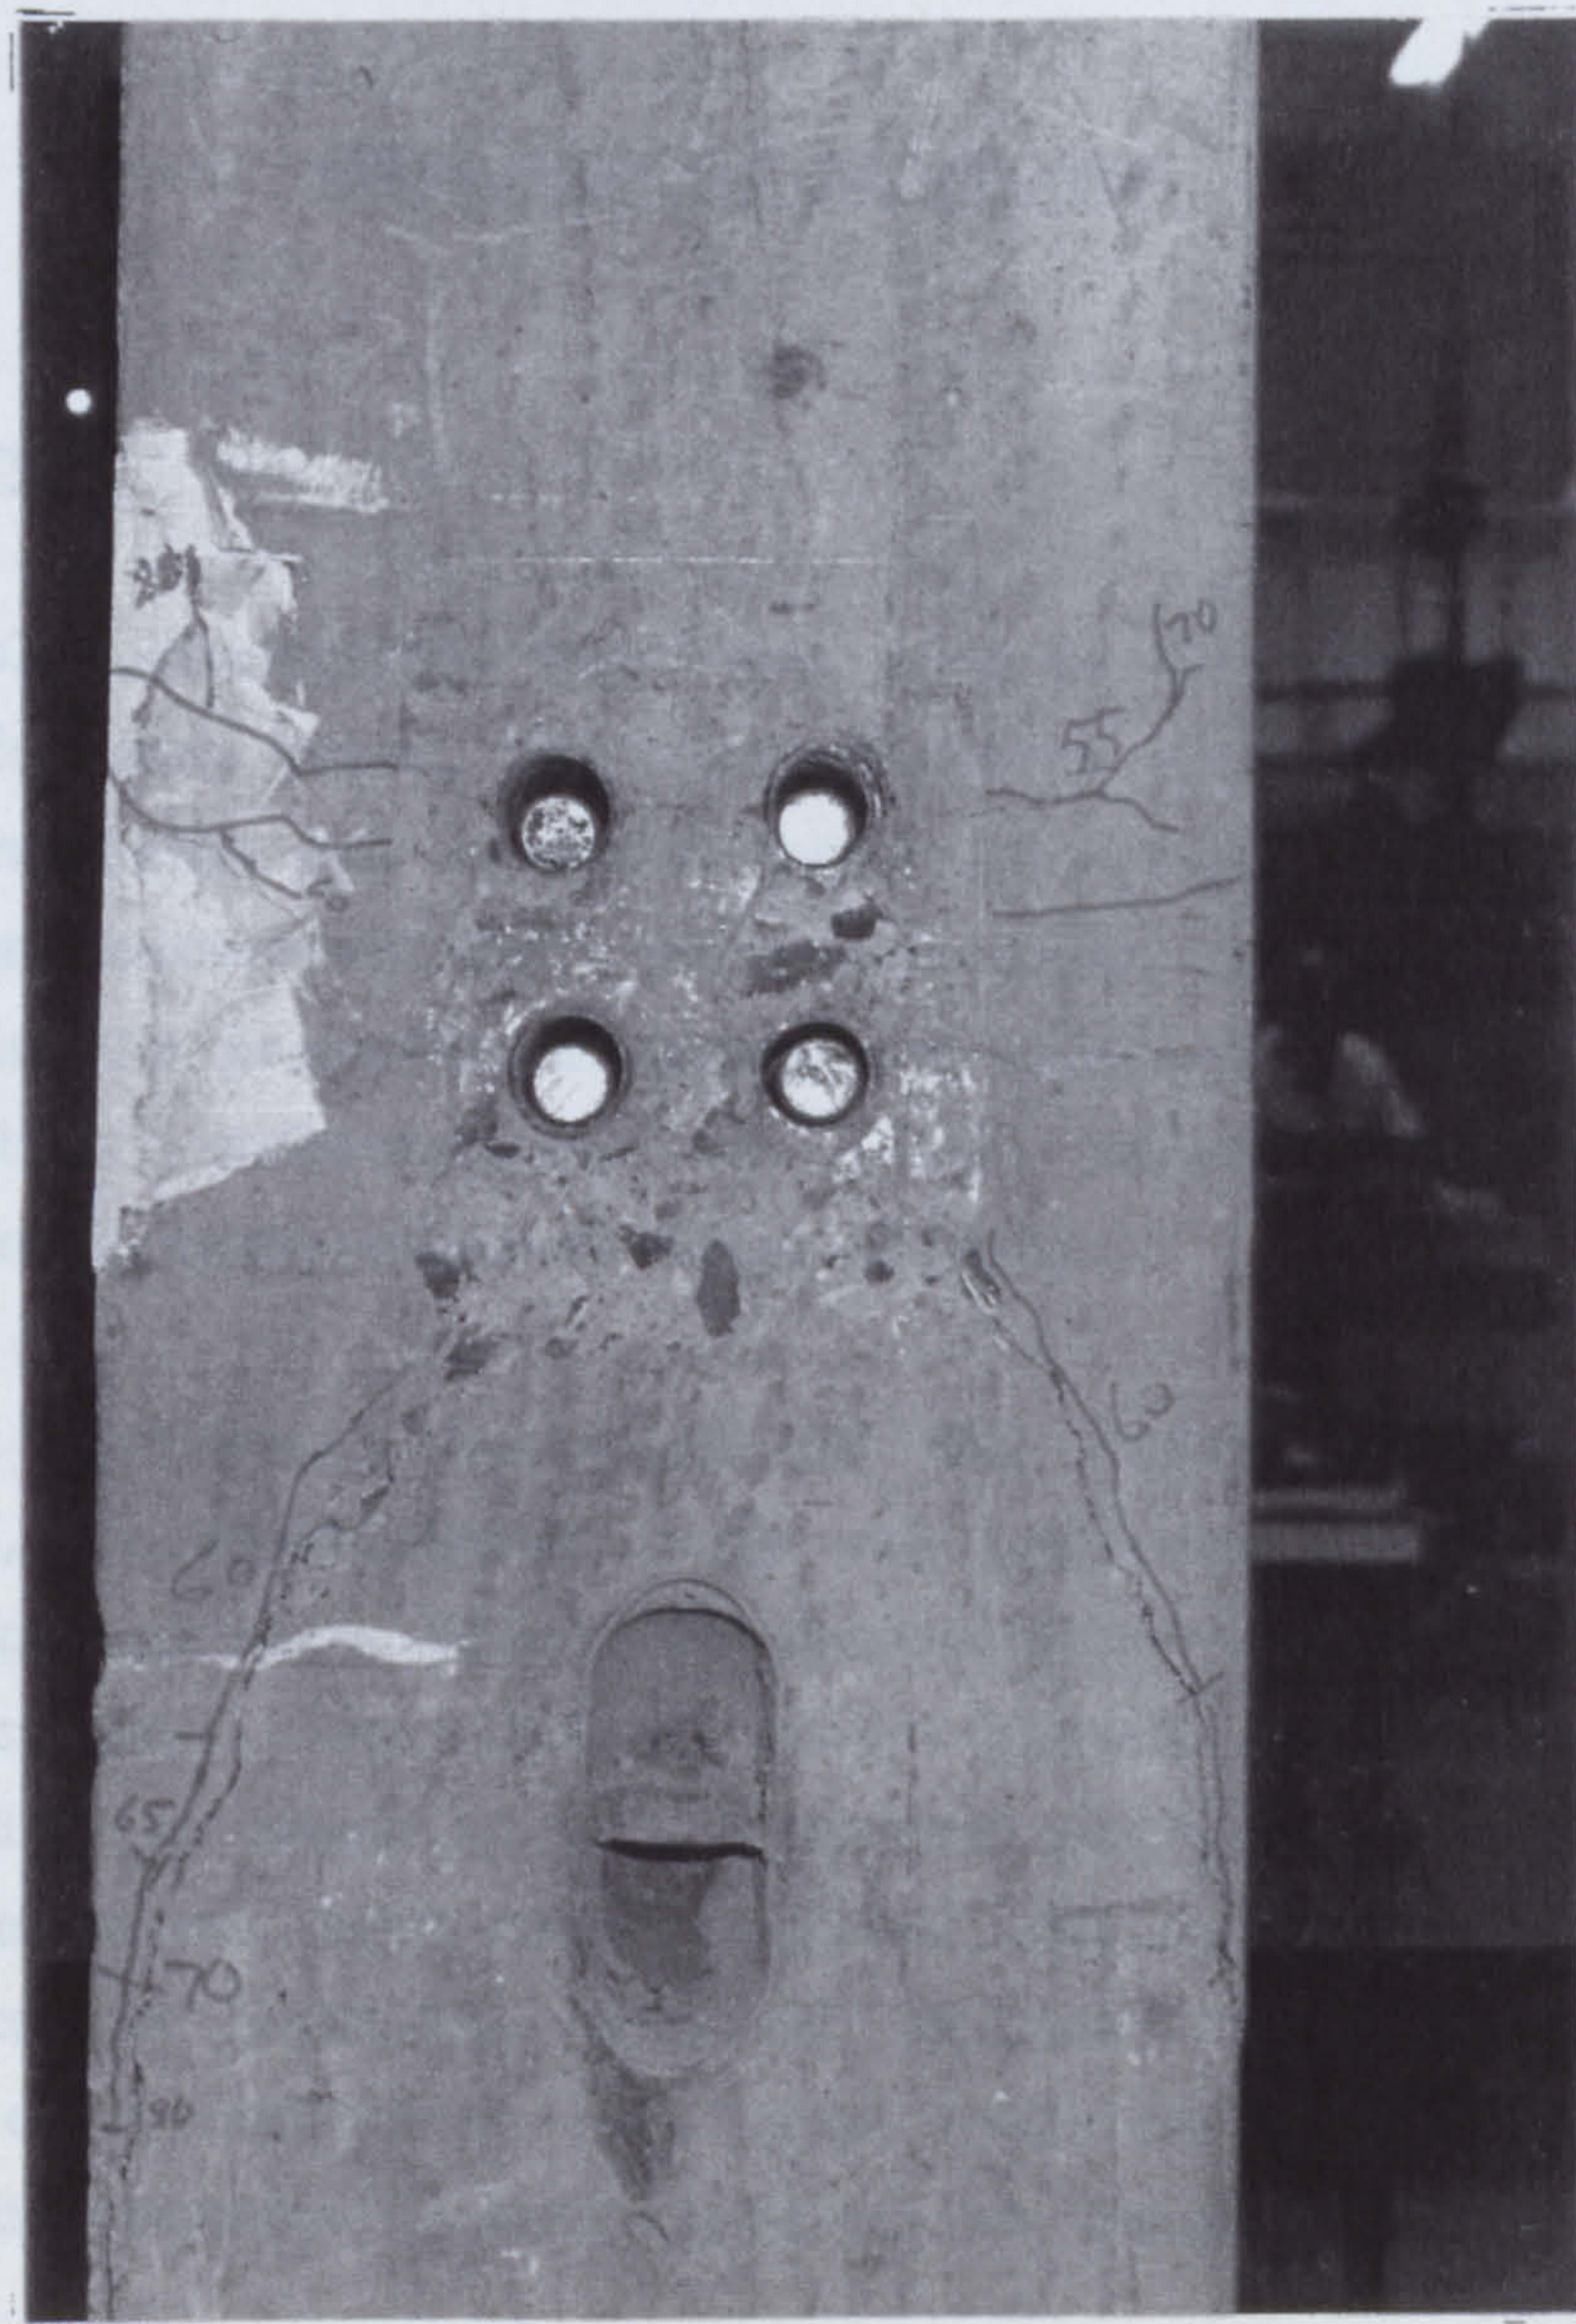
CONCRETE FAILURE CHARACTERISED BY THE DEVELOPMENT OF
